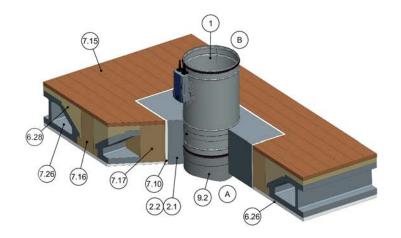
Mortar-based installation into historical wooden beam ceilings, shown upright (also applicable for suspended arrangement)
